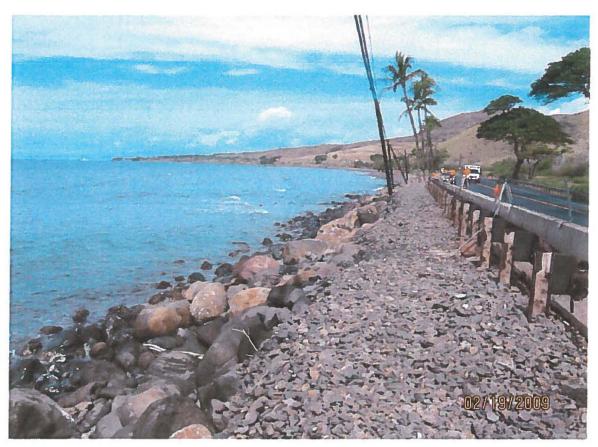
Northeast View of Project Site; Honoapi`ilani Highway on right. Existing concrete Jersey Barriers located next to guardrails
